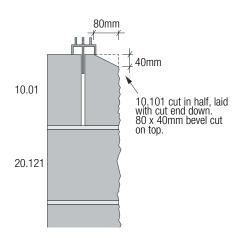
Sill Detail - Single Skin Wall Series 200 Split Face Designer Block
